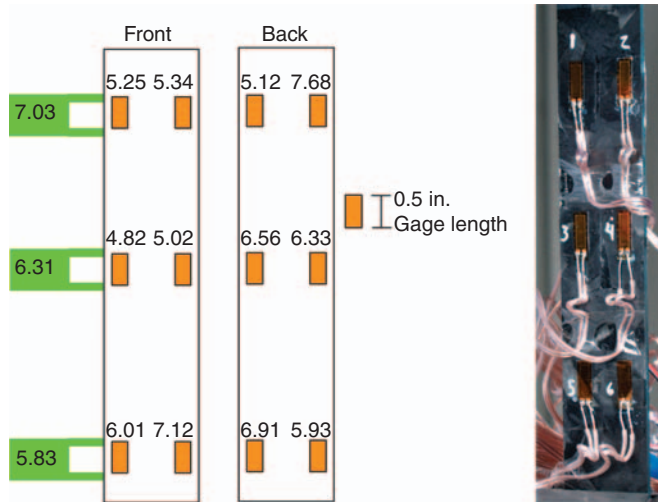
Specimen 6 features twelve 0.5 in. (12.7 mm) gages in the front and back sections, in the top, center, and bottom portions of the specimen.
